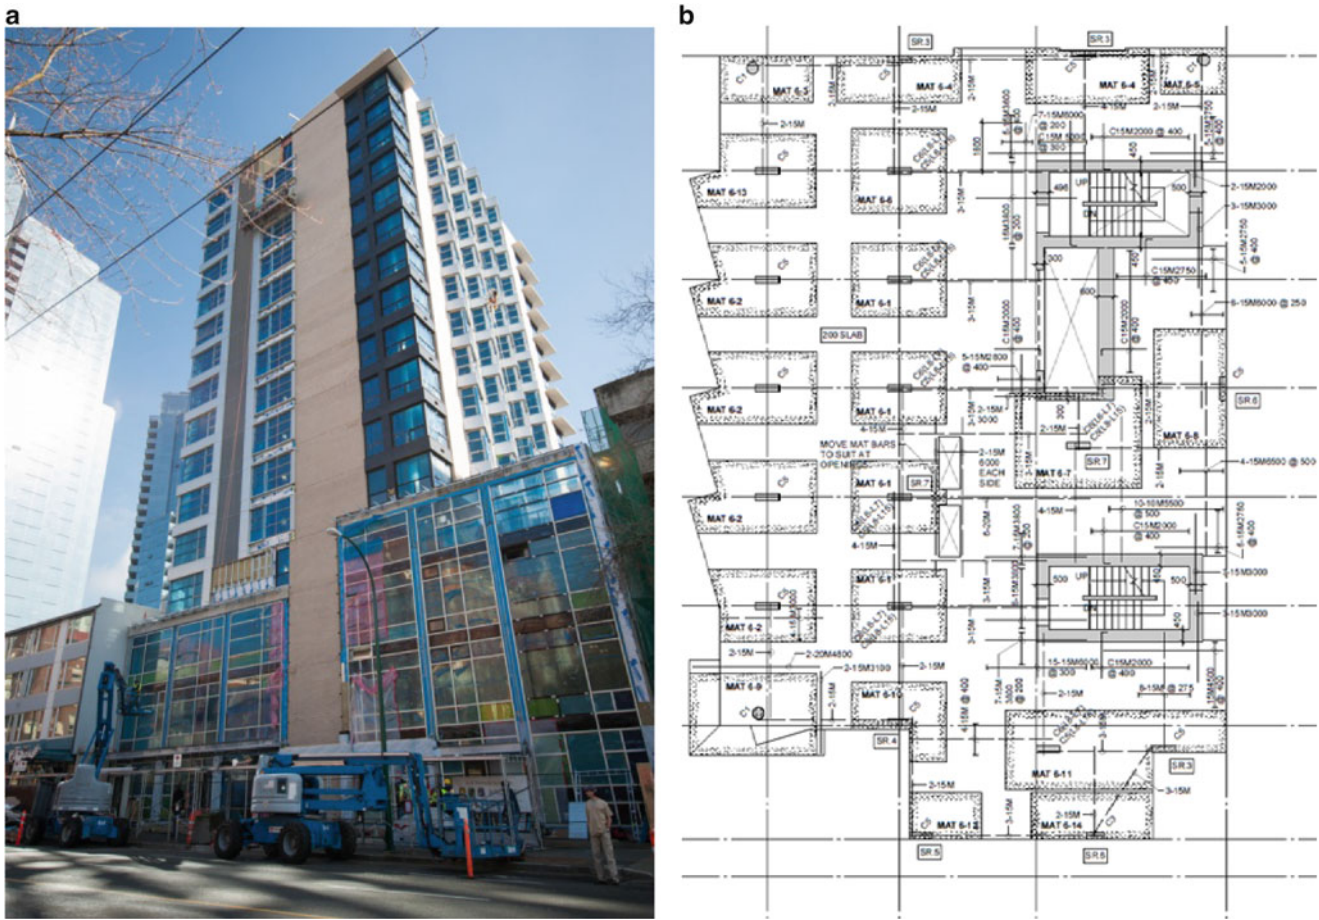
Photo of the investigated building (a) and typical floor plan (b)
